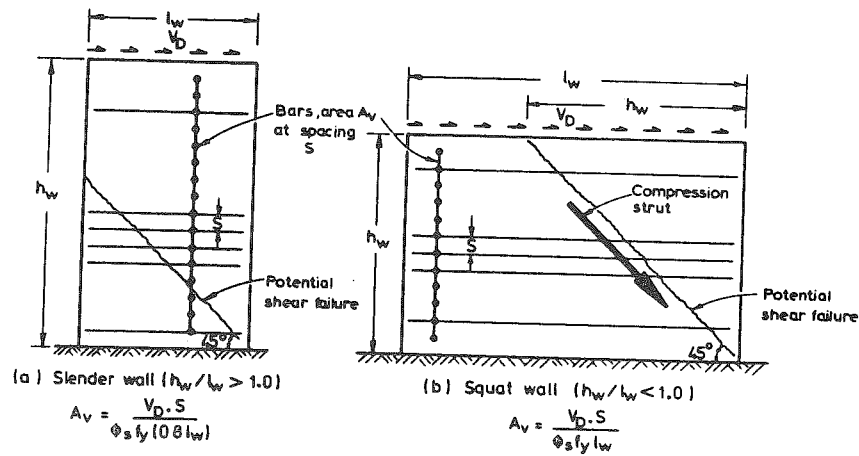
SHEAR CAPACITY OF HORIZONTAL REINFORCEMENT IN WALLS
